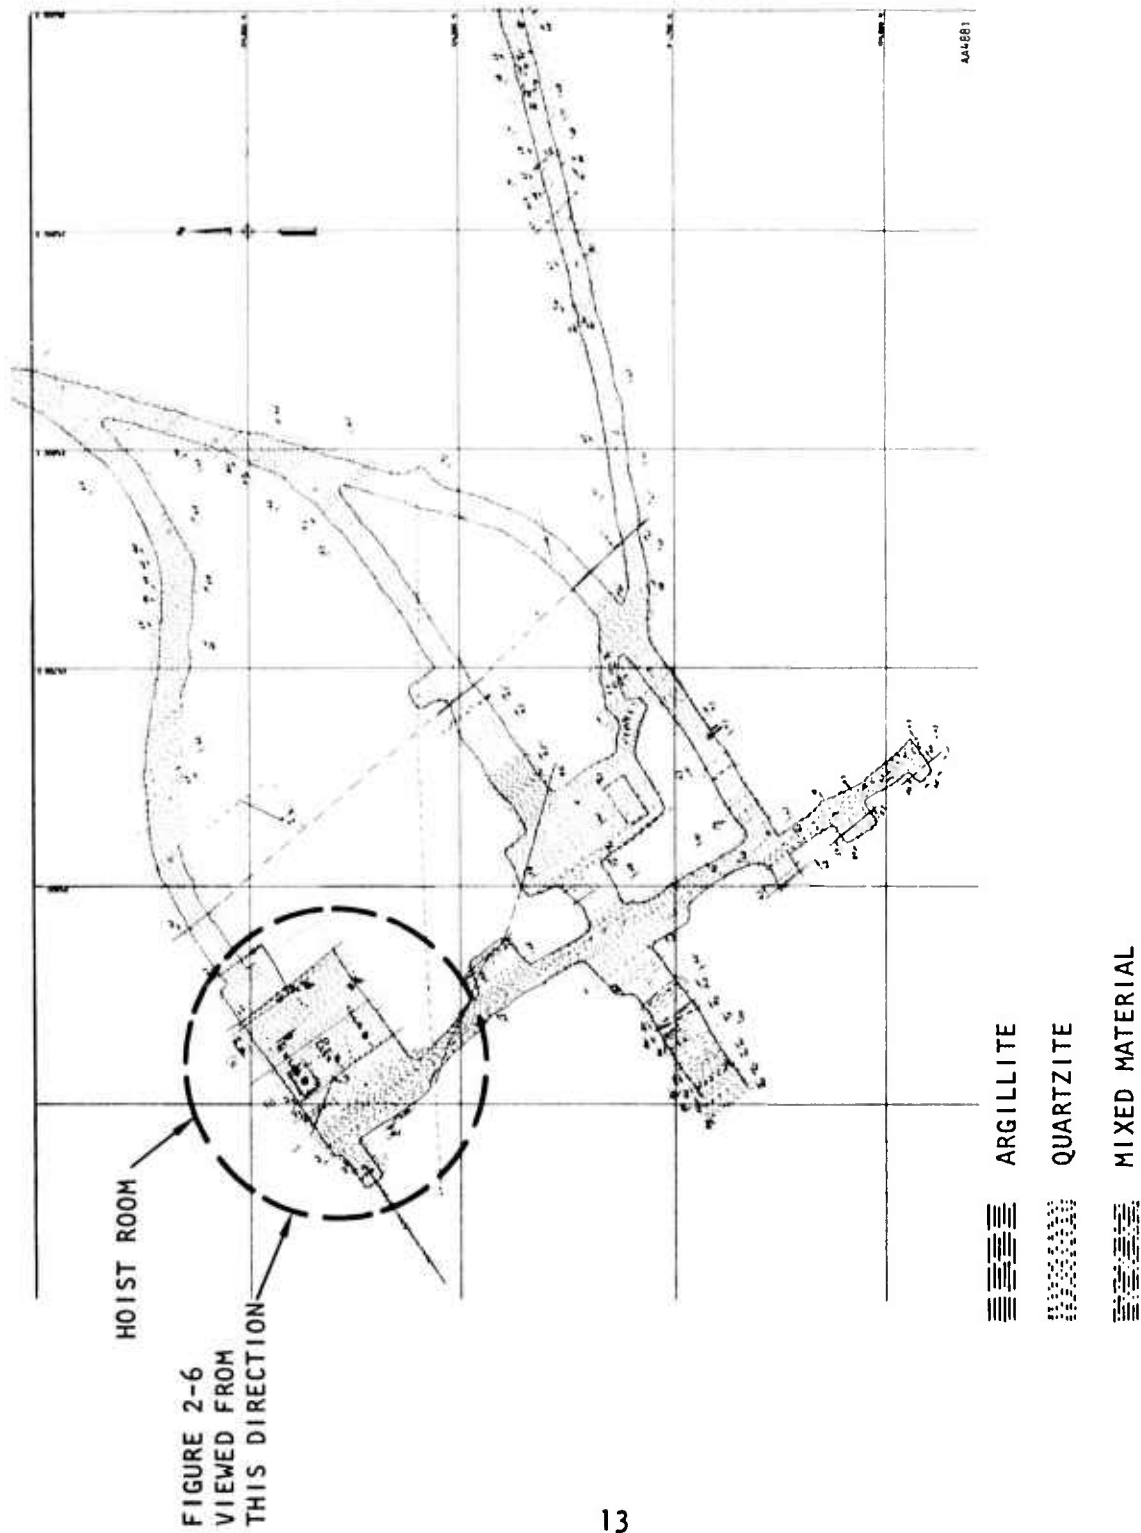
PLAN VIEW OF HOIST ROOM AND CONNECTING DRIFTS AT CALADAY PROJECT
